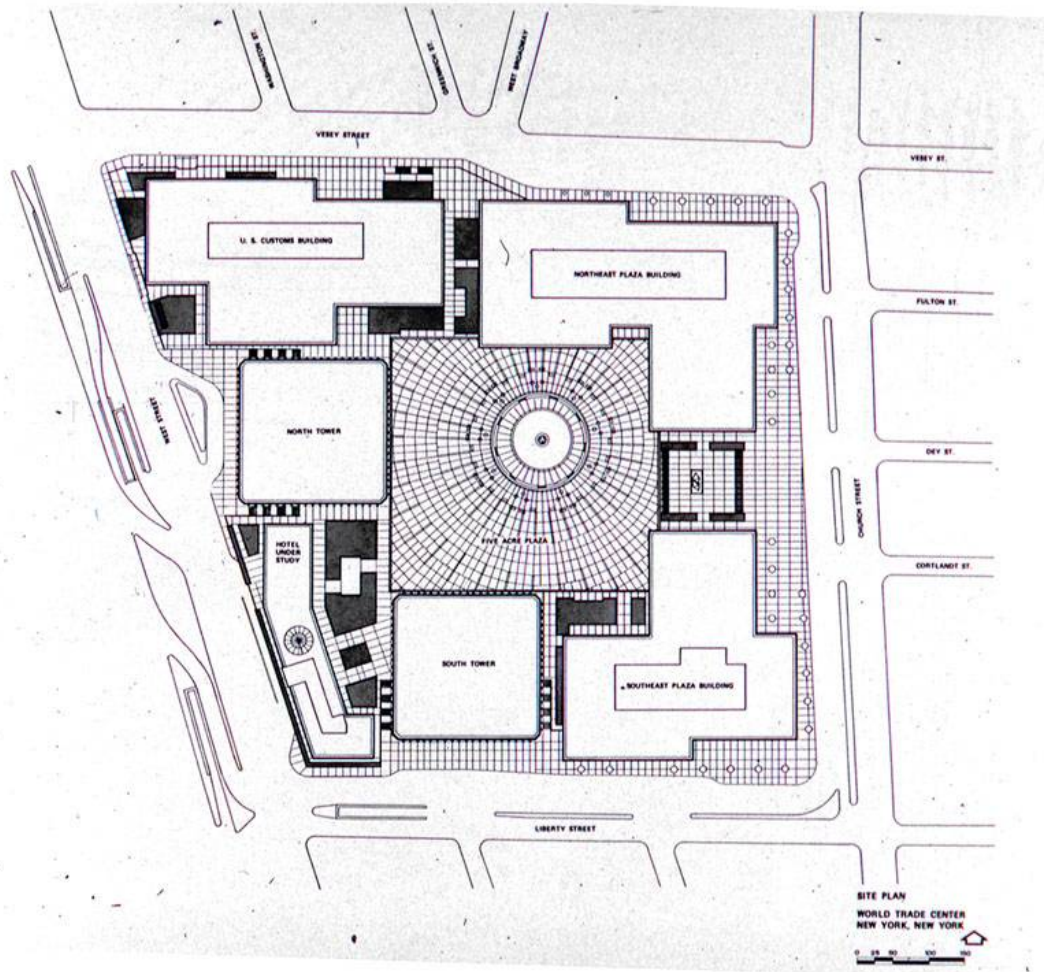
Planning diagram for World Trade Center illustrating the superblock concept where the use large buildings makes public plazas possible. Source: Site Plan, World Trade Center, Forum Skyscraper Page.com <http://forum.skyscraperpage.com/showthread.php?t=172731&page=23>
